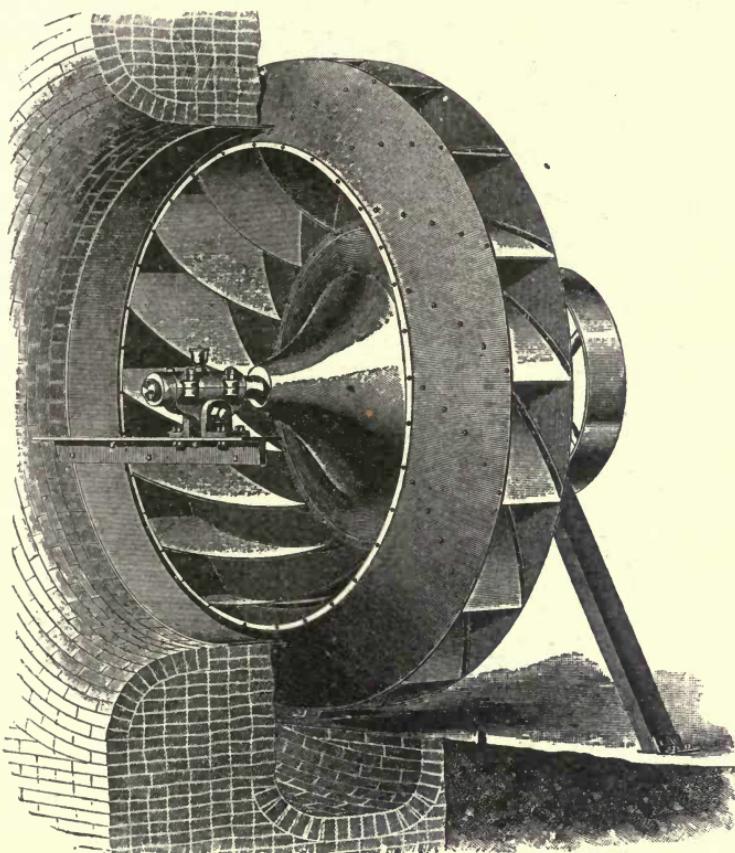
"Cone" Fan. Discharges through Opening in Wall into a "Plenum Chamber" Connecting with Distributing Ducts.
